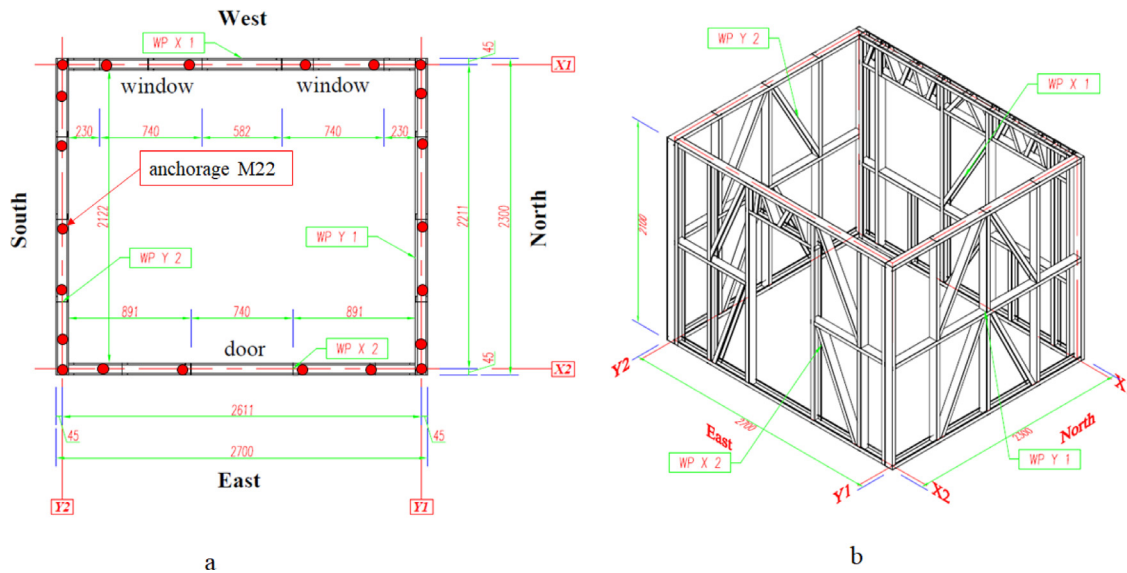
(a) Plan view of the structural model; (b) Axonometry of the wall panels.
